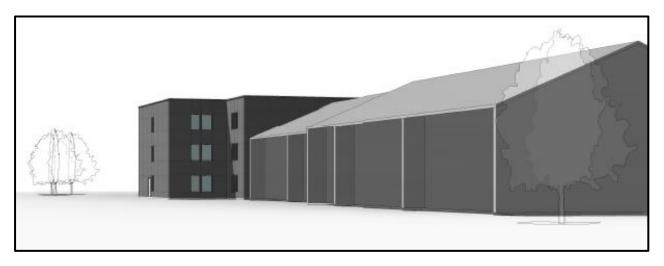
March 1, 2023 Concept - East Isometric of the New Addition to the Existing Building (revised with additional space planning requirements)
